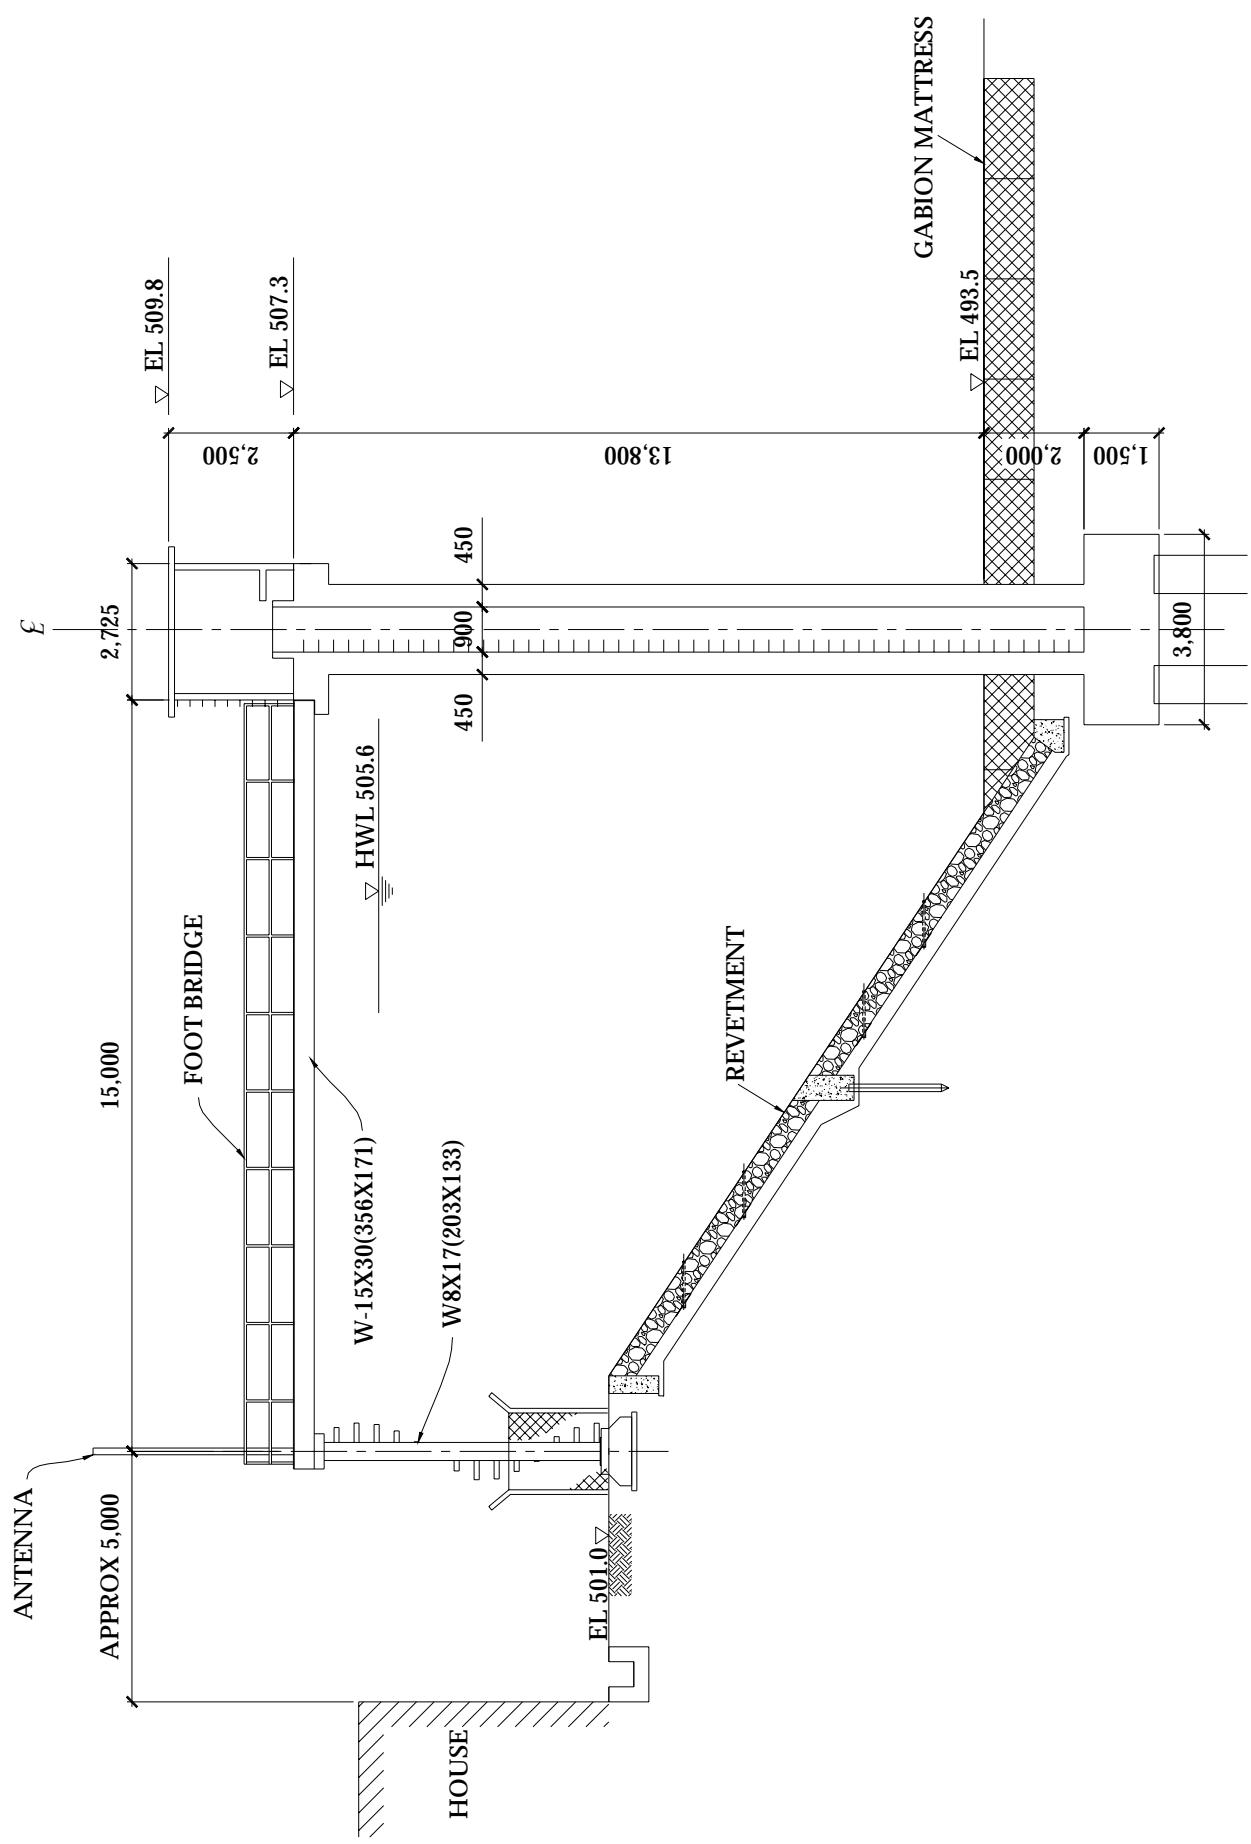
Elevation of Water-level Gauging Station (Katarian Bridge)
